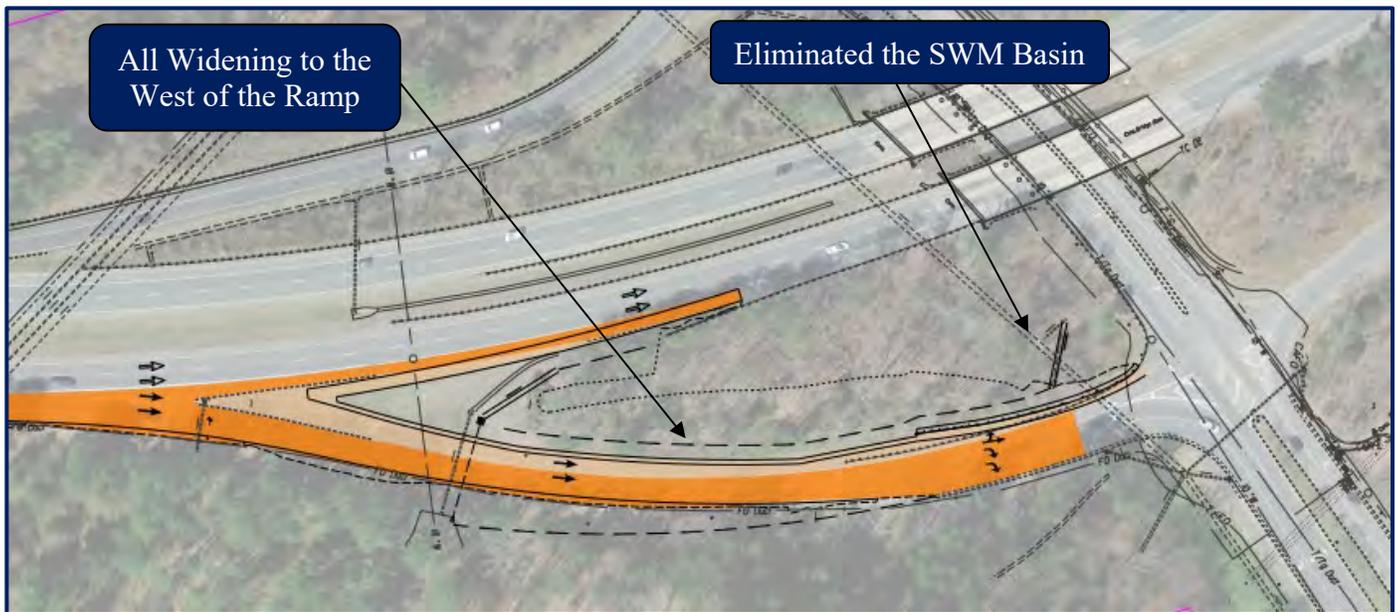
NB 29 Exit Ramp to Fontaine Avenue
